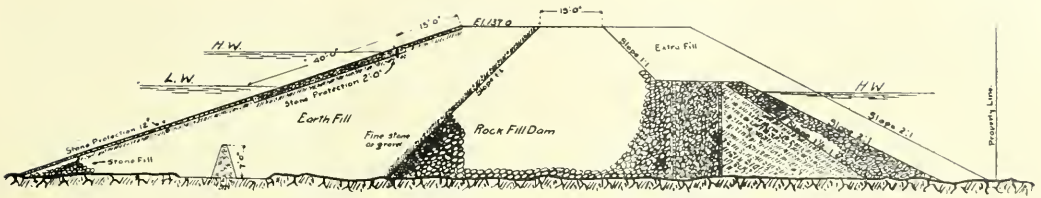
Typical cross-section of dam at south bank of canal—Cedars Rapids Mfg. and Power Co.
